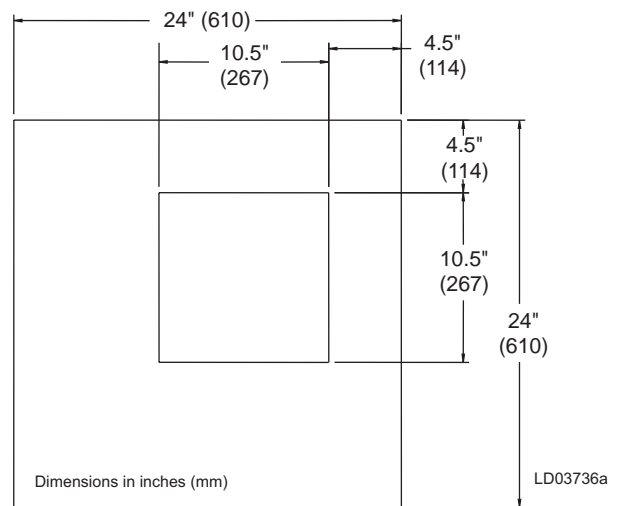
FLOOR PANEL OPENING FOR 10 X 10 GRILLES
